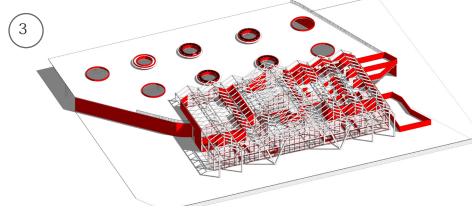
Curtain wall and dry wall infill (Masu 2023) The infill being the curtain wall and drywall.
